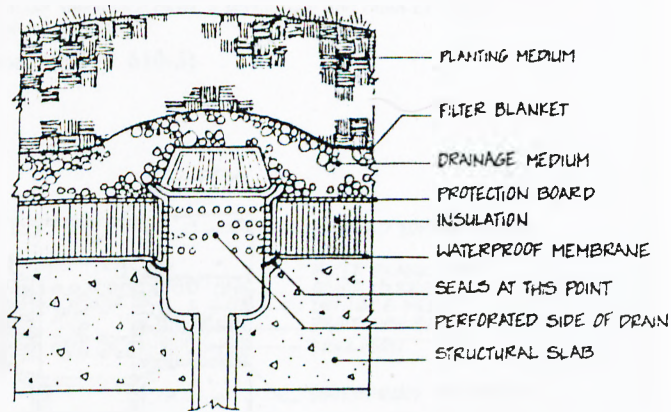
Roof Drain under Planting Area. Insulation layer placed directly on waterproof membrane with perforated protection board to prevent damage to insulation. Water reaching the insulation is carried off through the roof drain.
